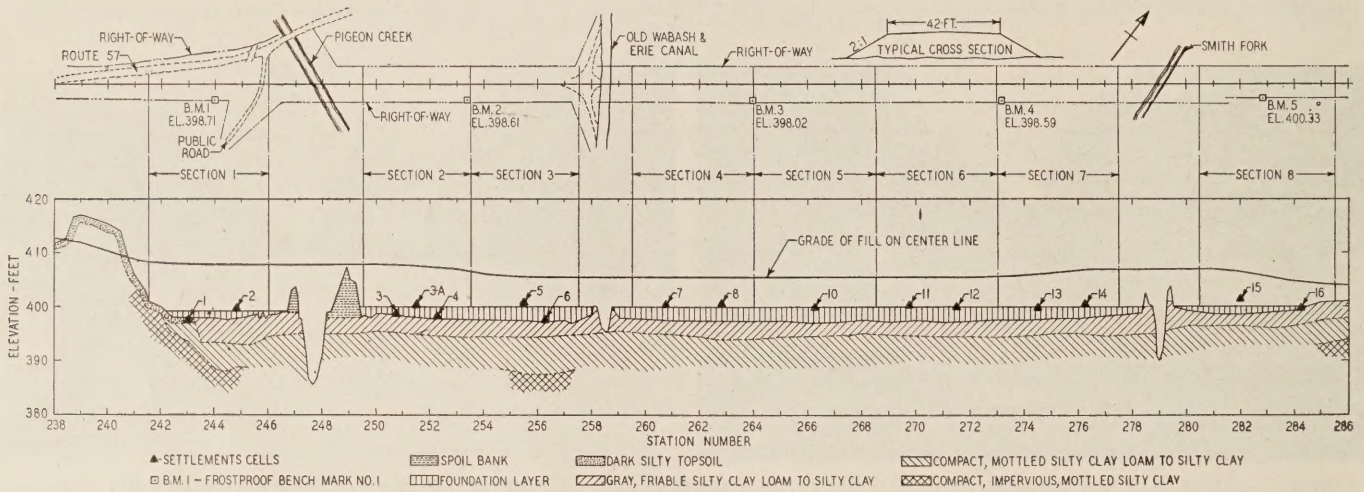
PLAN, PROFILES, AND DETAILS OF EXPERIMENTAL SECTION IN GIBSON COUNTY, INDIANA.
